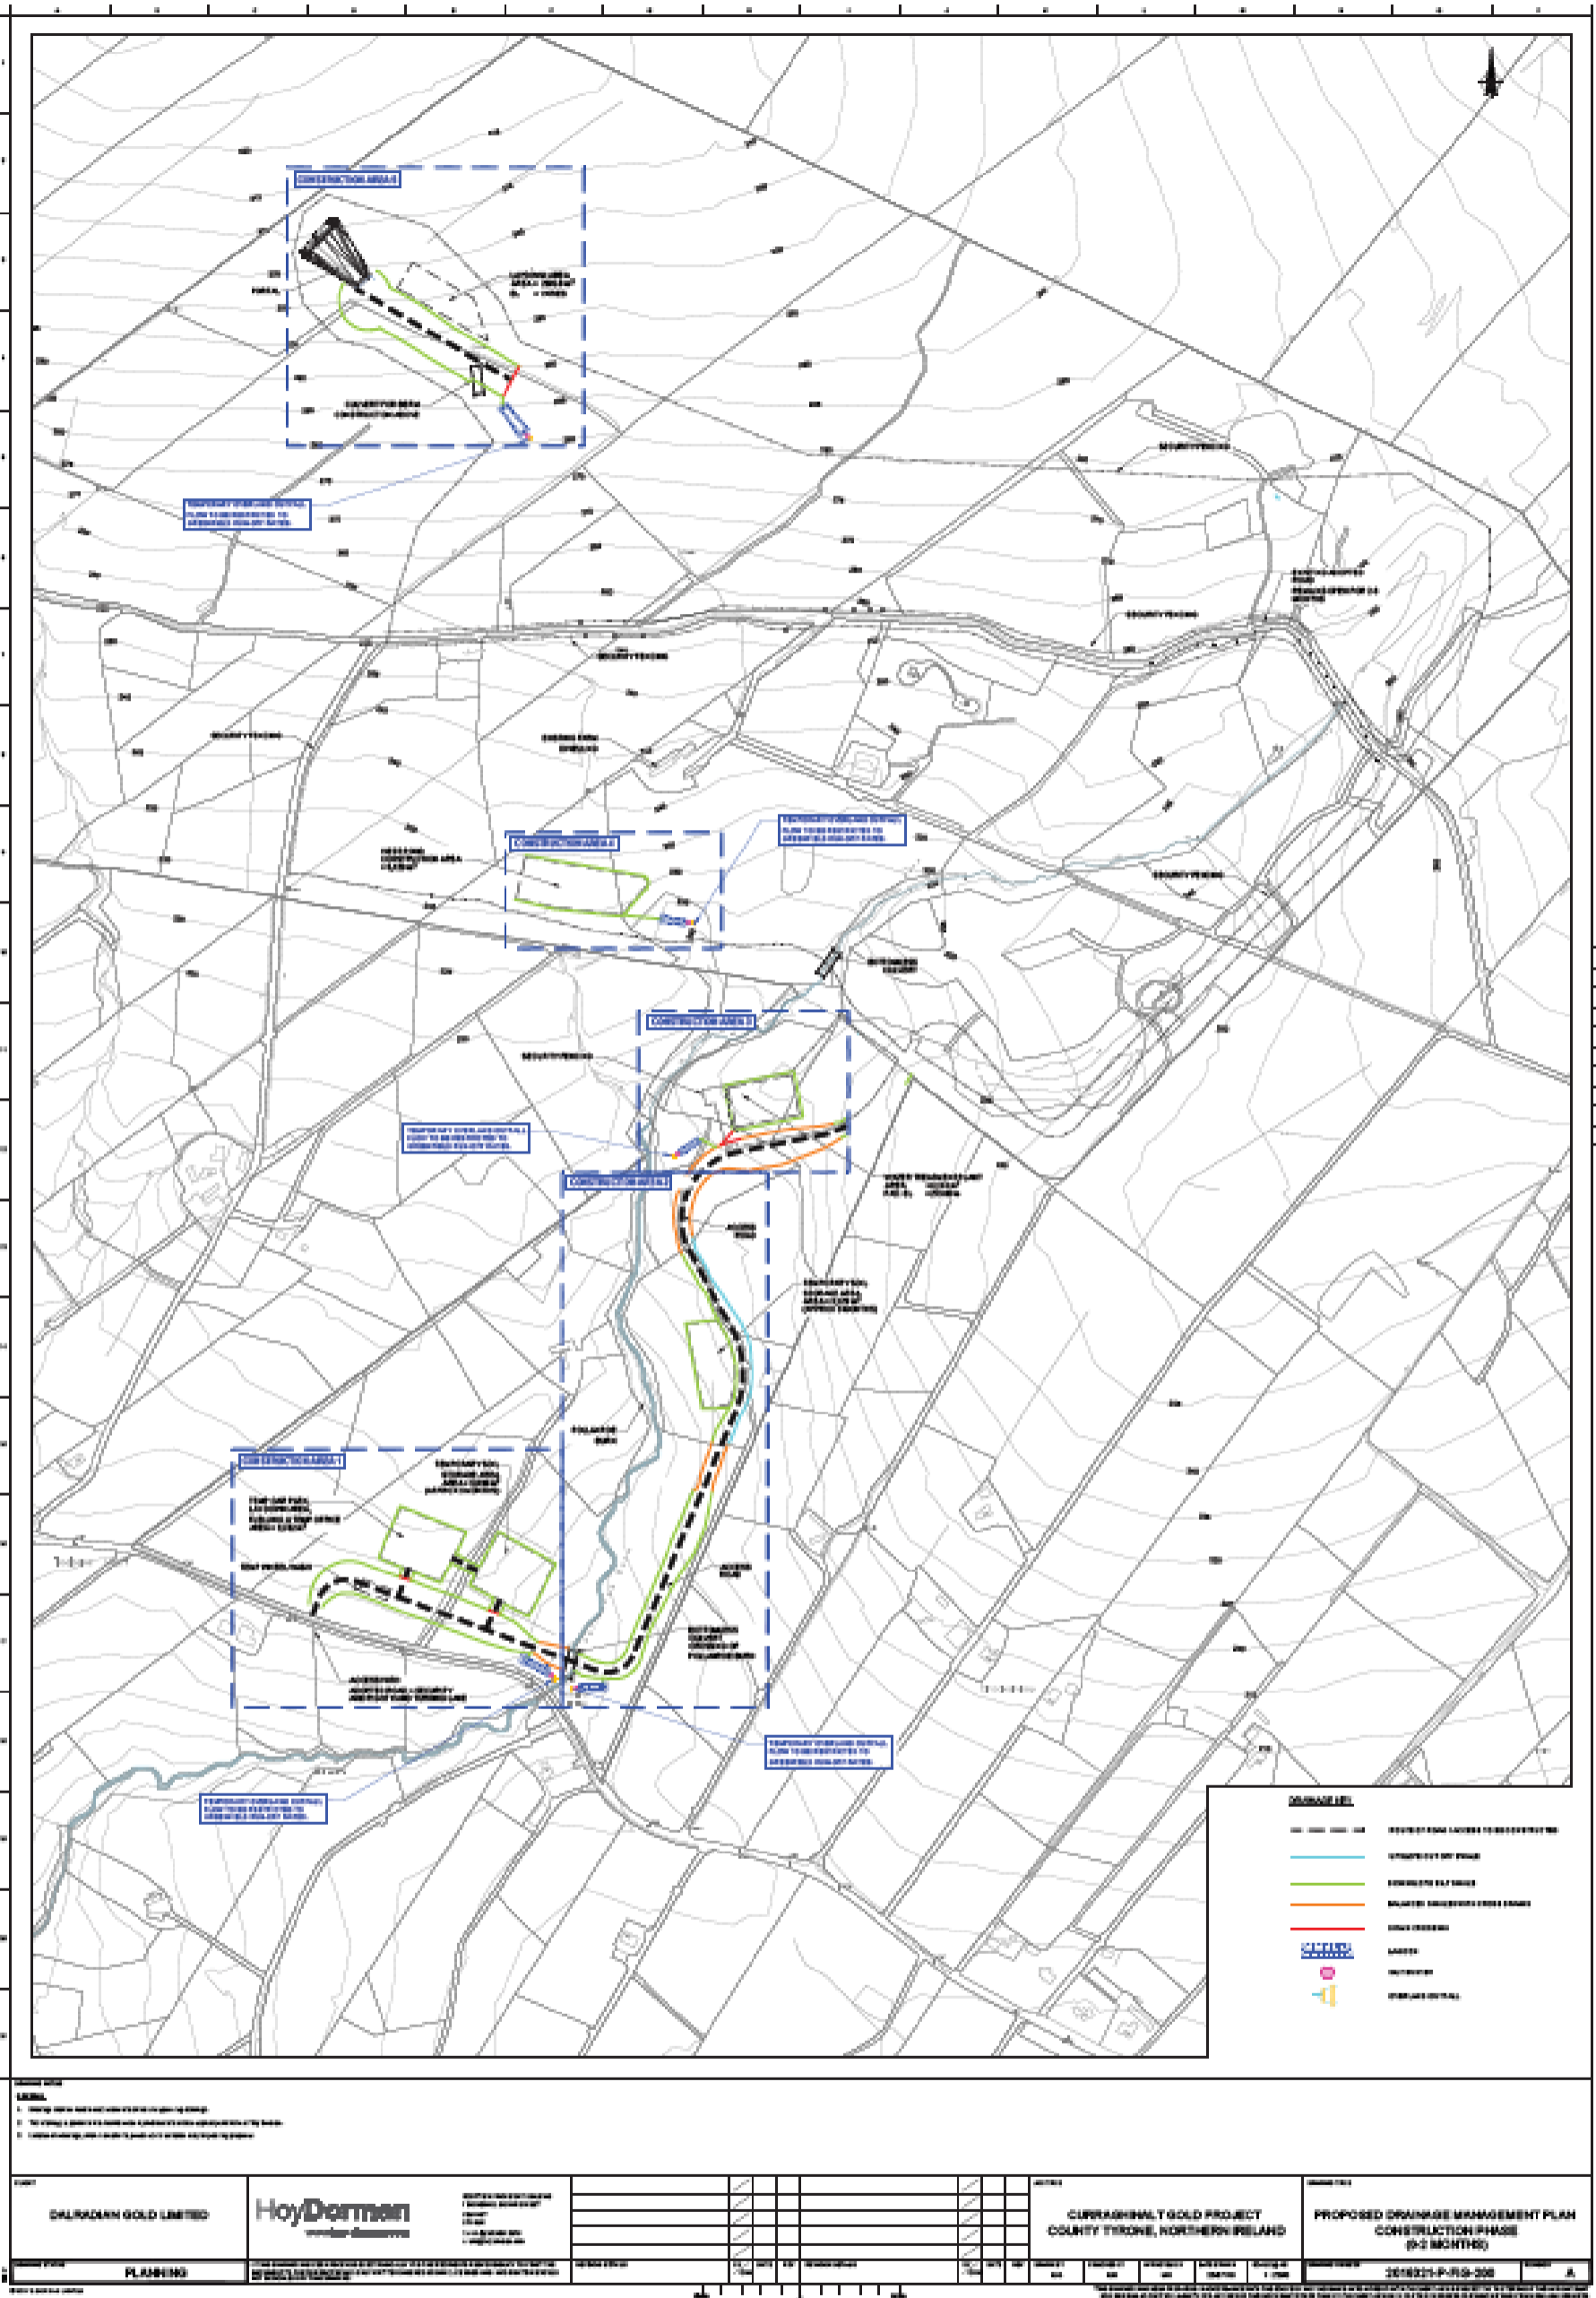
Proposed Drainage Management Plan Construction Phase (from CEMP)
